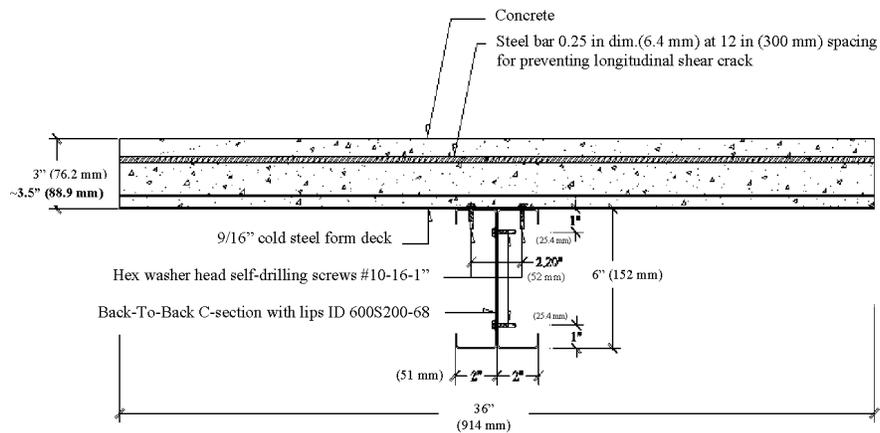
Non-composite section and details of connection (Specimens CB1 and CB3)
